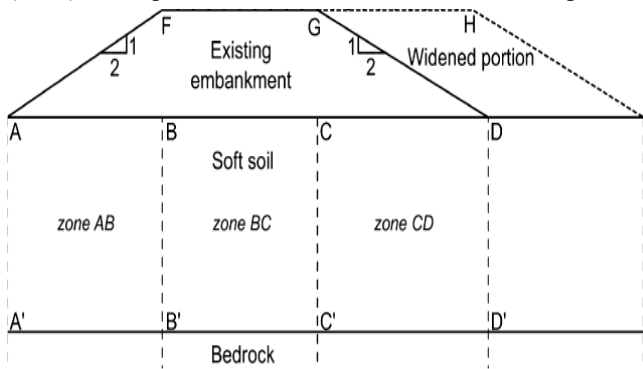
Example of a widened embankment supported by the soil-cement column [13]
